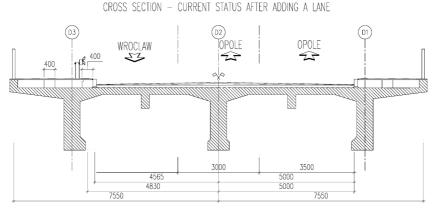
Schematic cross-section of the bridge – current state with three lanes
